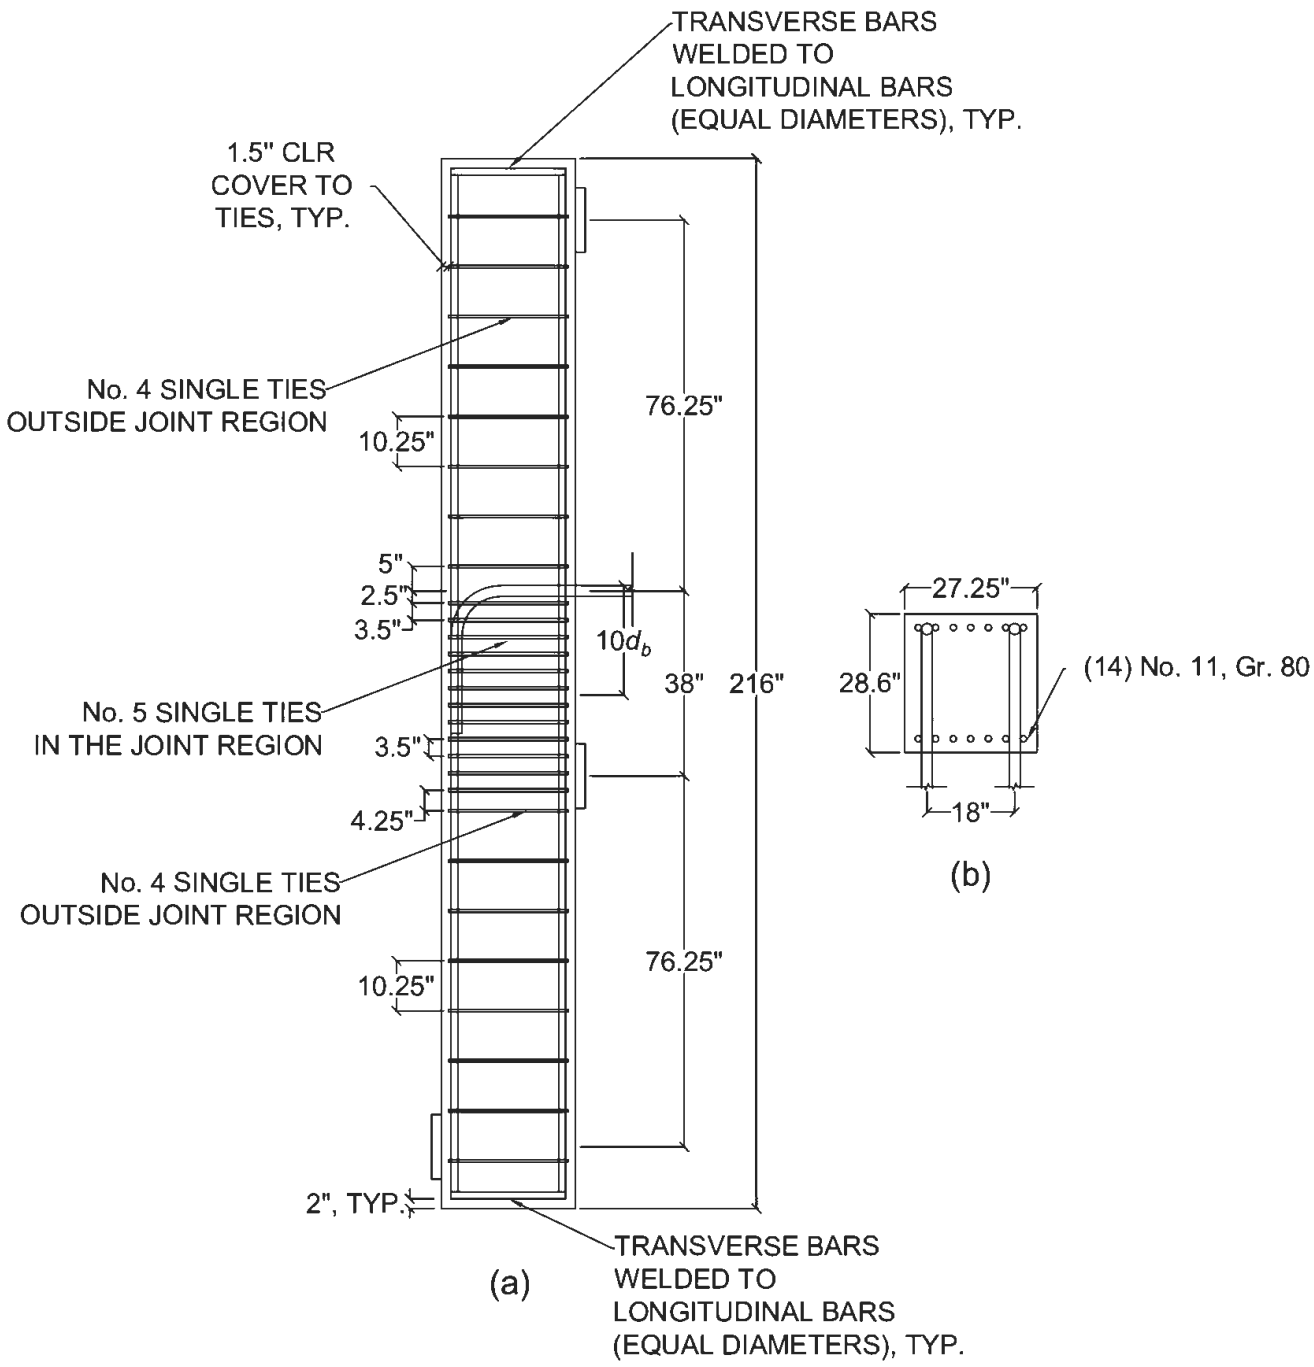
Details of reinforcement layout for No. 18 hooked bar specimen H18-2: (a) elevation, (b) cross-section
